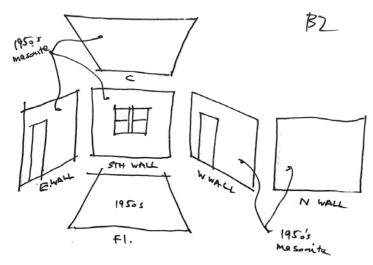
Sketch of 1952/3 Interior Modifications to Bedroom 2
